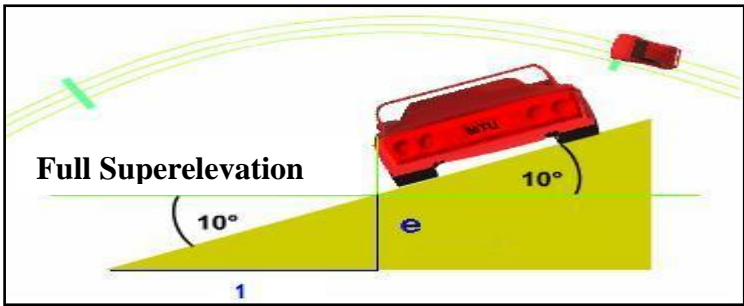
(b): Methods of Applying Super Elevation on Existing Roads
